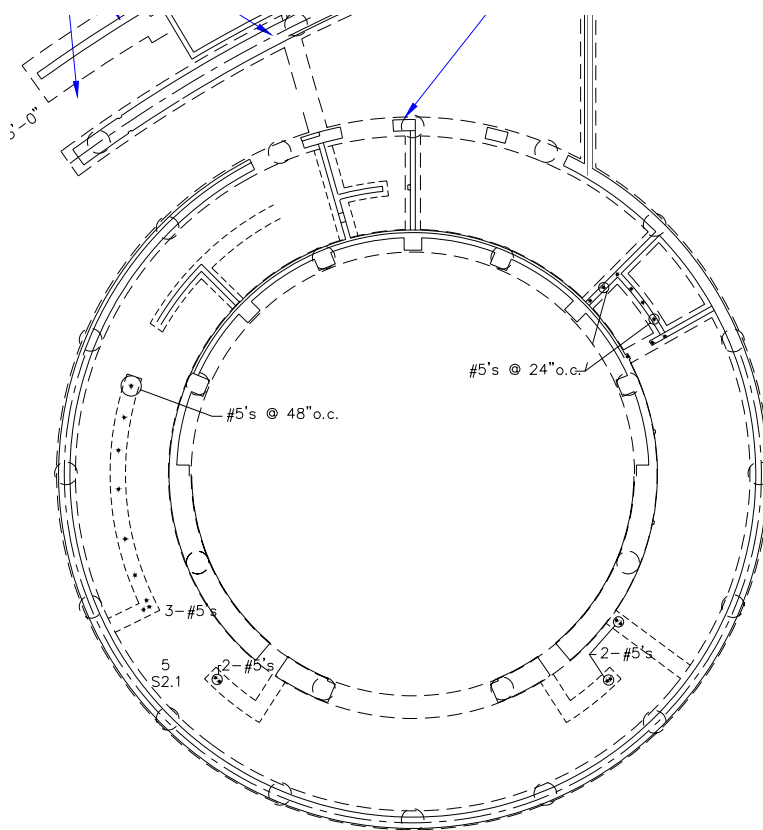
FIRST FLOOR HDF STRUCTURAL LAYOUT (EMC)
